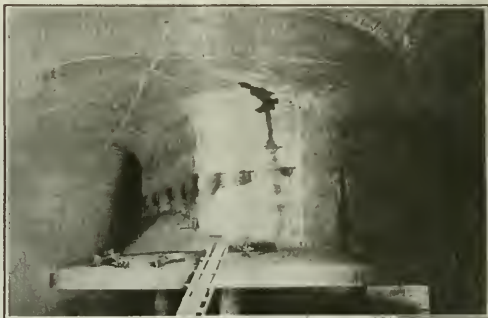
HYDRAUCONE REGAINER IN DRAFT TUBE
